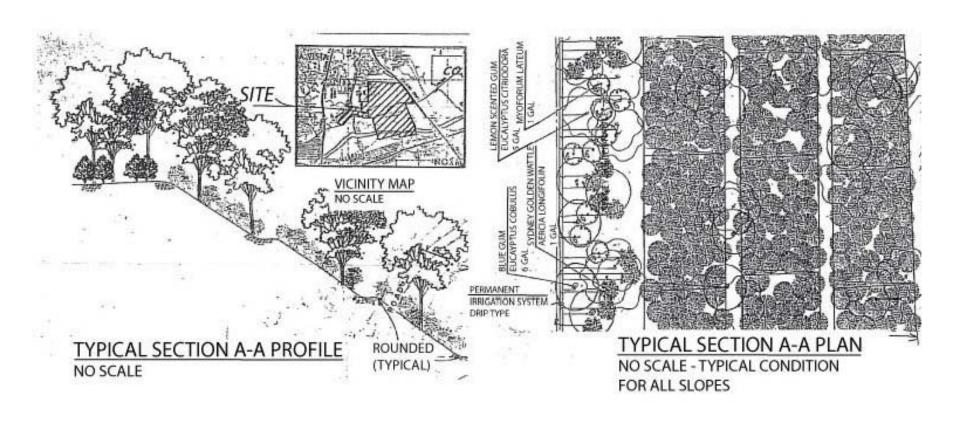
Existing Approved Reclamation Plan Revegetation Plan
